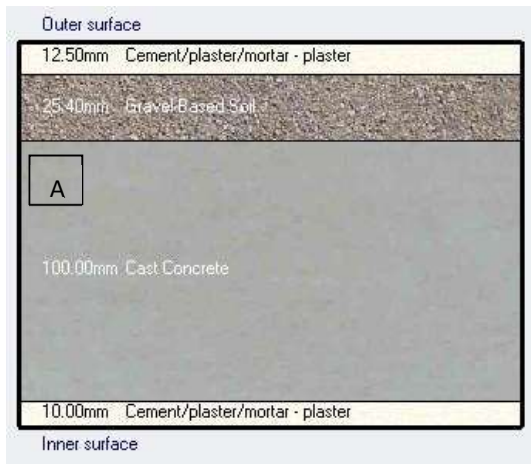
Layer-By-Layer Construction (Outside To Inside)
